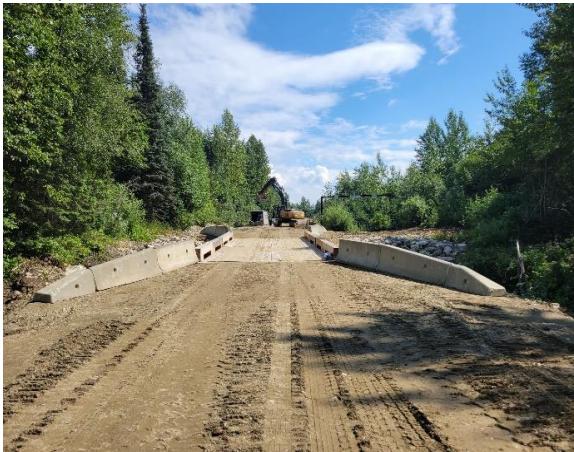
Bridge deck installation and final inspection. (July 24, 2024).
